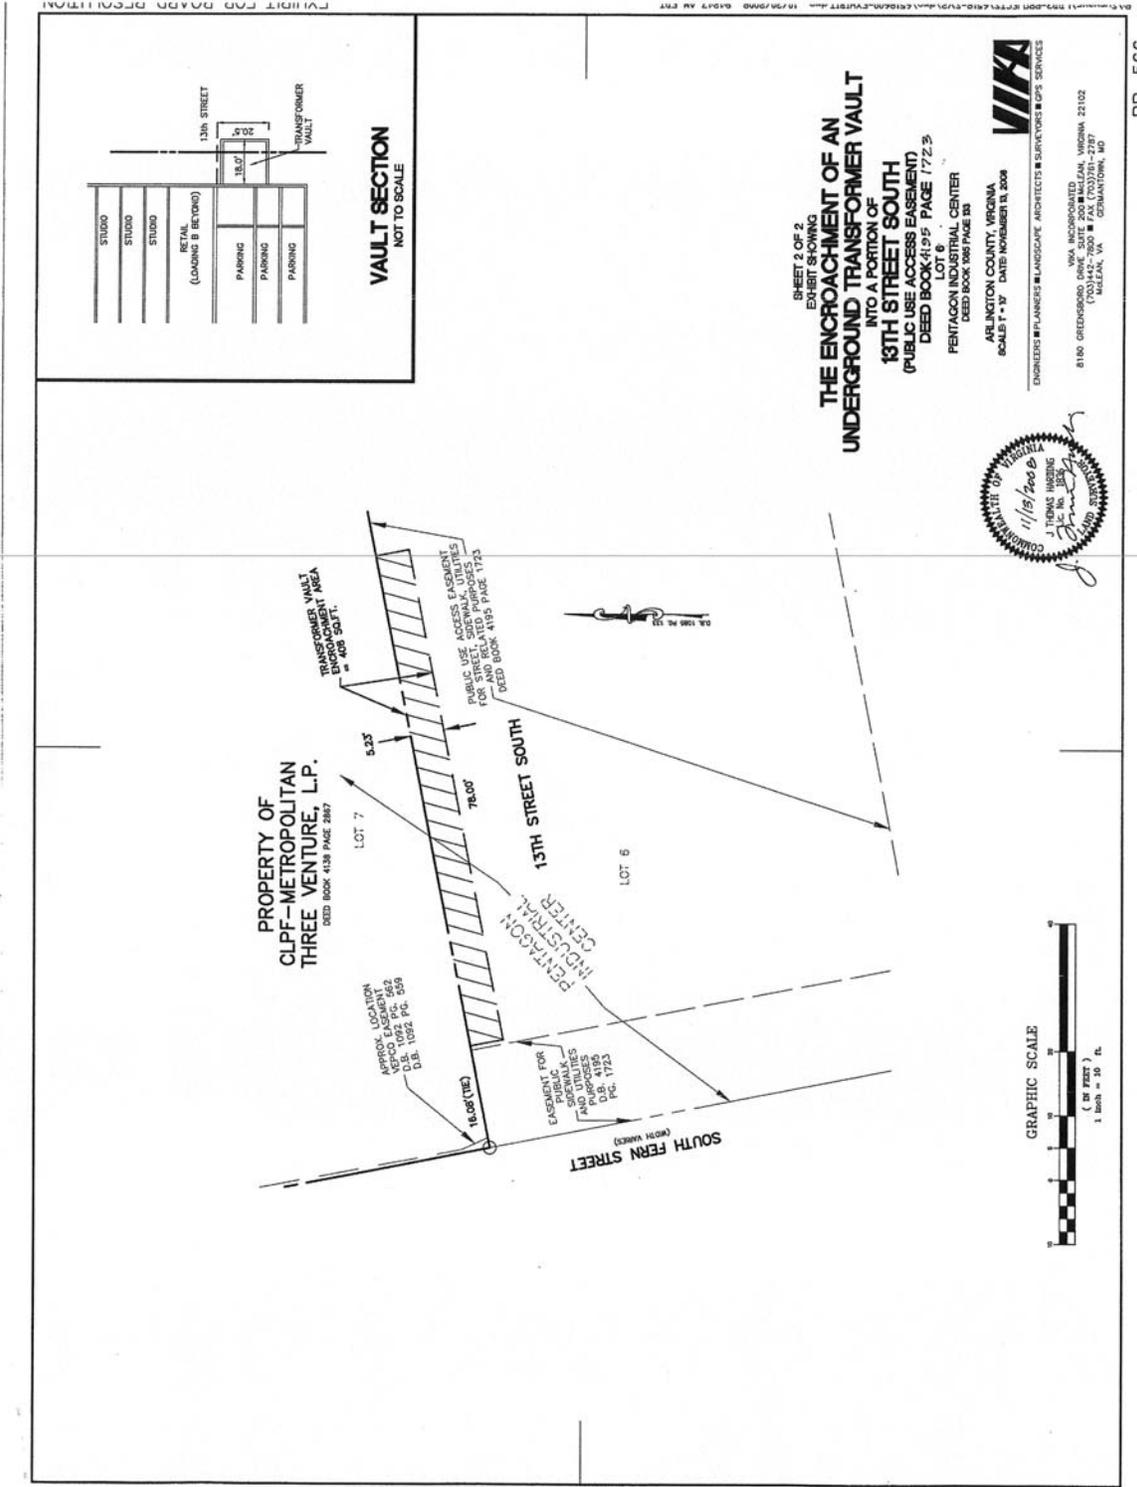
ENCROACHMENT PLAT – Sheet 2 of 2
